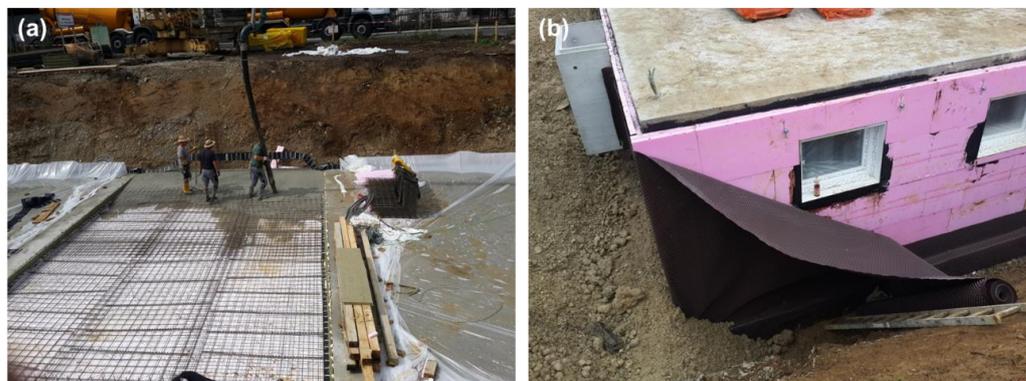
Measures to prevent rising damp on a construction site in Germany: (a) measures for a lower ground floor, (b) measures for basement walls.
